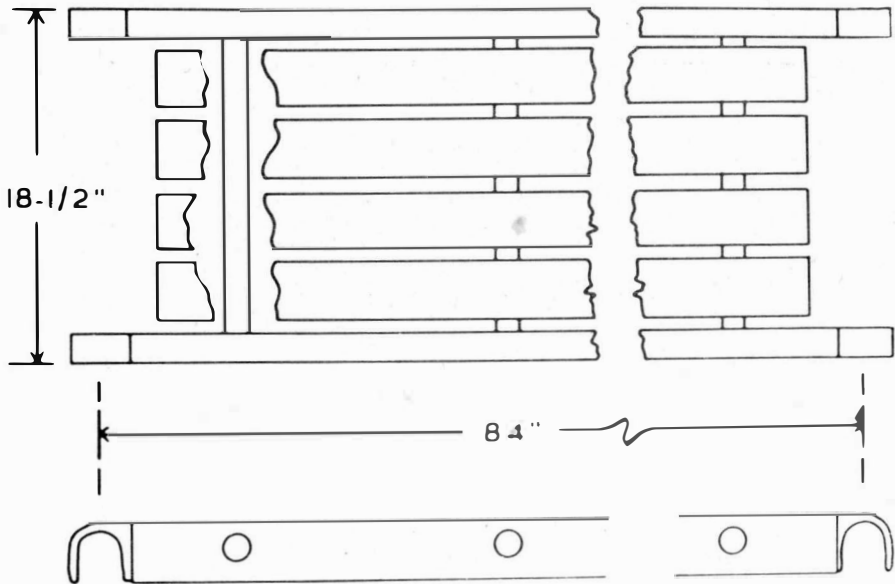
Removable staging unit which may be used to form part of a platform at each five-foot level on the tower.
